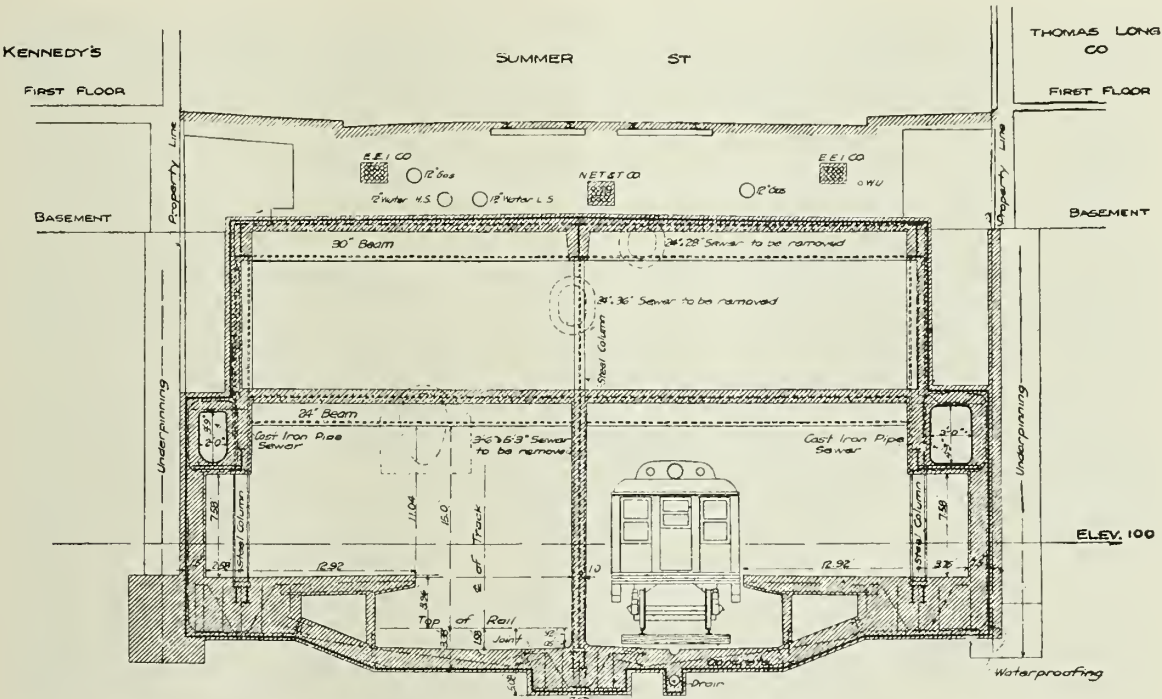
Section B. Dorchester Tunnel. Cross Section 70 ft. East of Hawley St.
